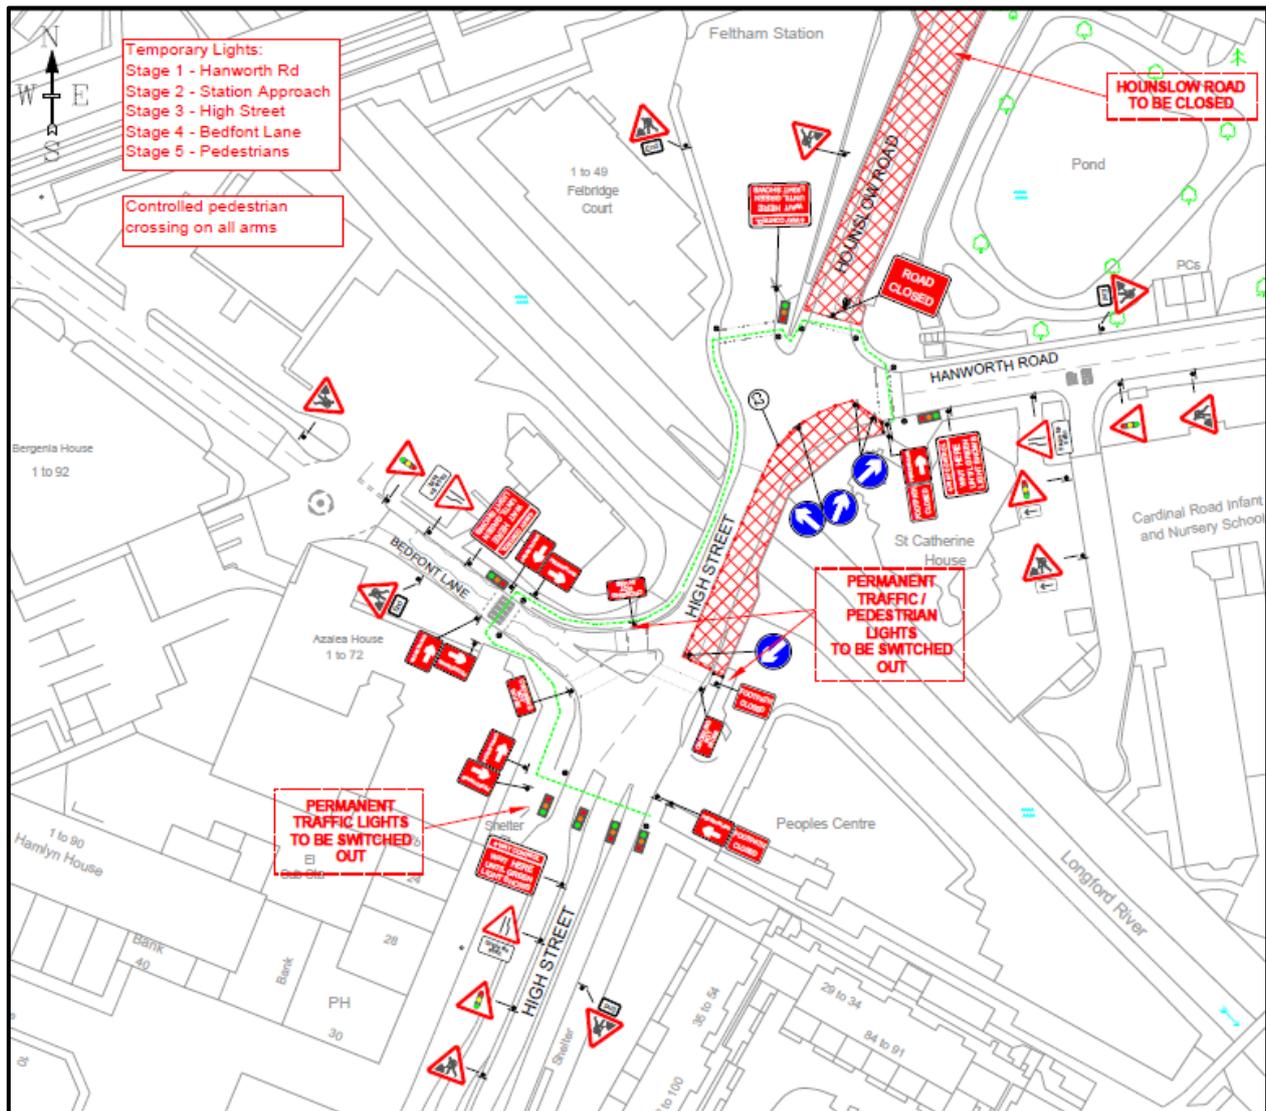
Traffic Management and Method of Control for temporary lights at the junction of Hounslow Road/Hanworth Road/Station Approach/Bedfont Lane/High Street
